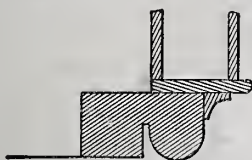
Detail of Jambs of Window in Ground Floor.
